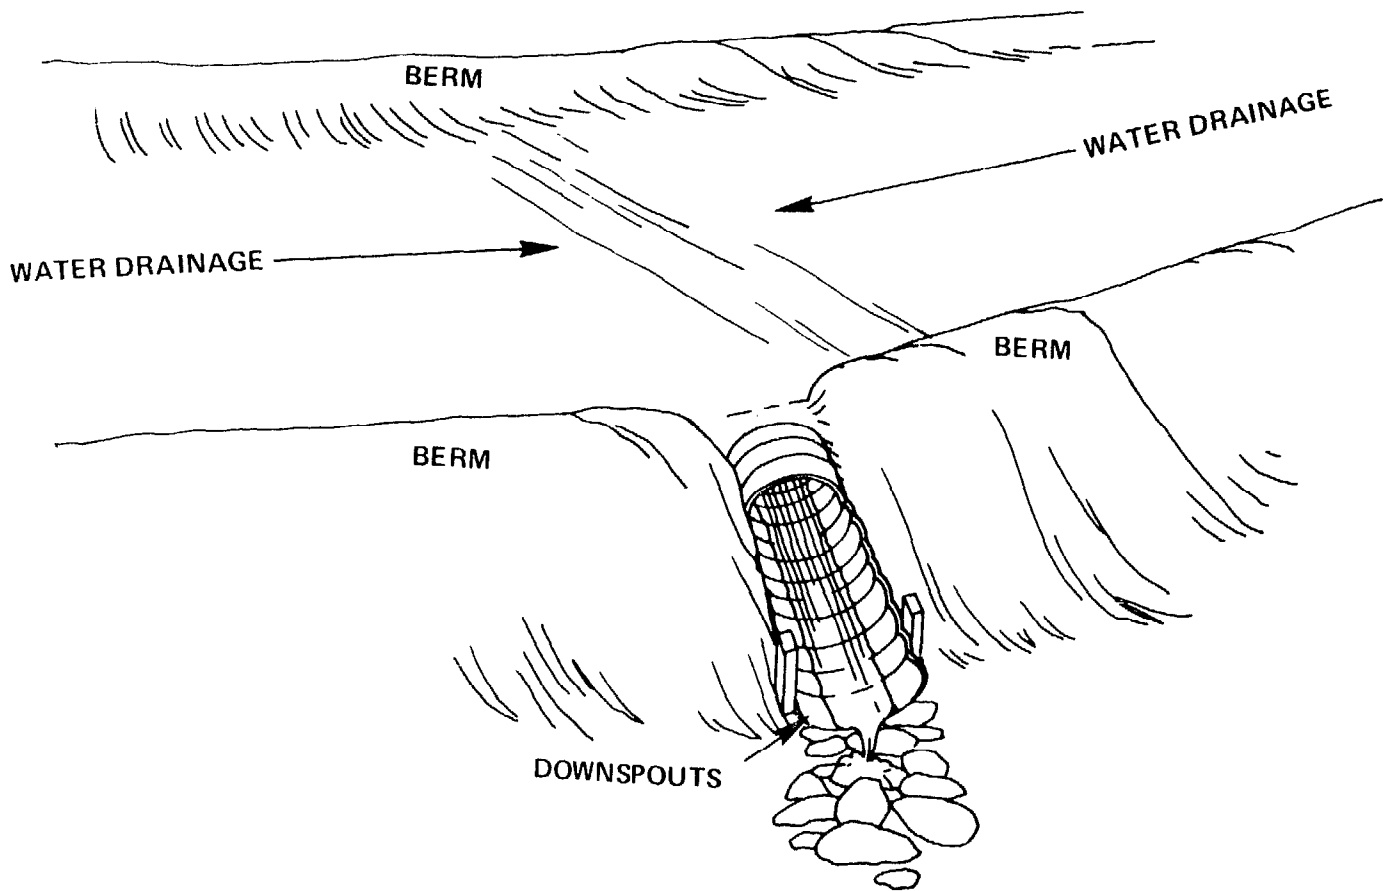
Construction of a downspout in a berm. Excess water accumulations on a berm must be drained by a downspout.
